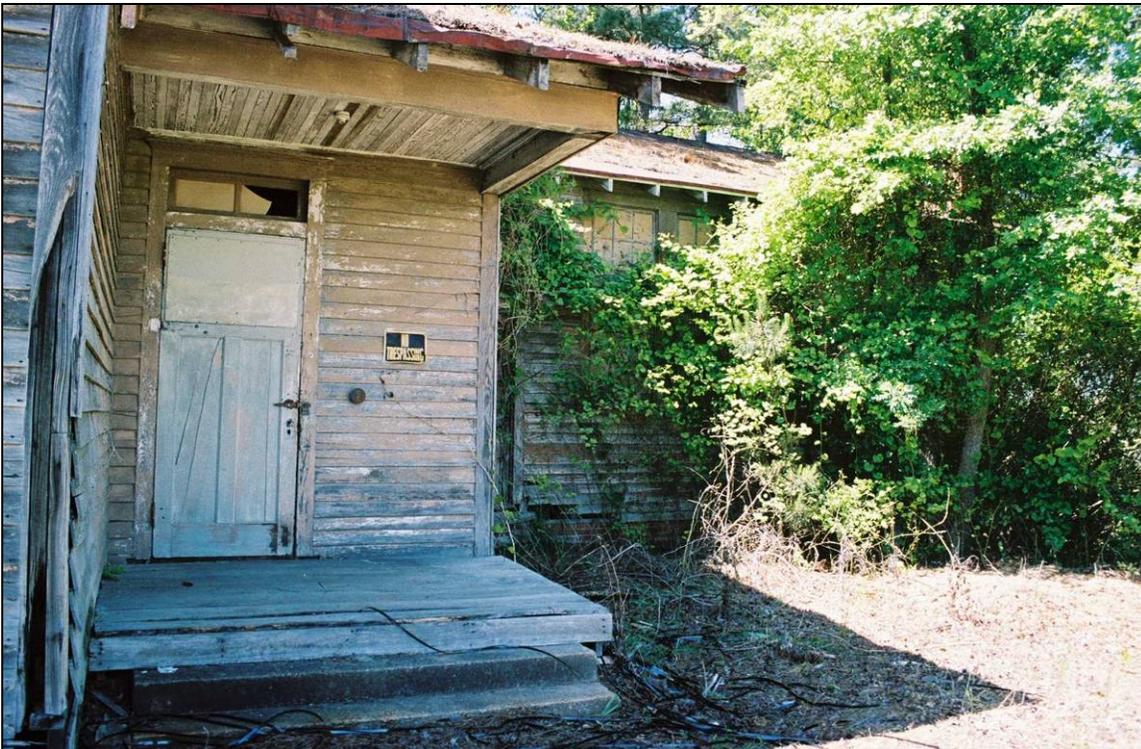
Jeffrey School: entry and porch at northeast corner; later wing at right
